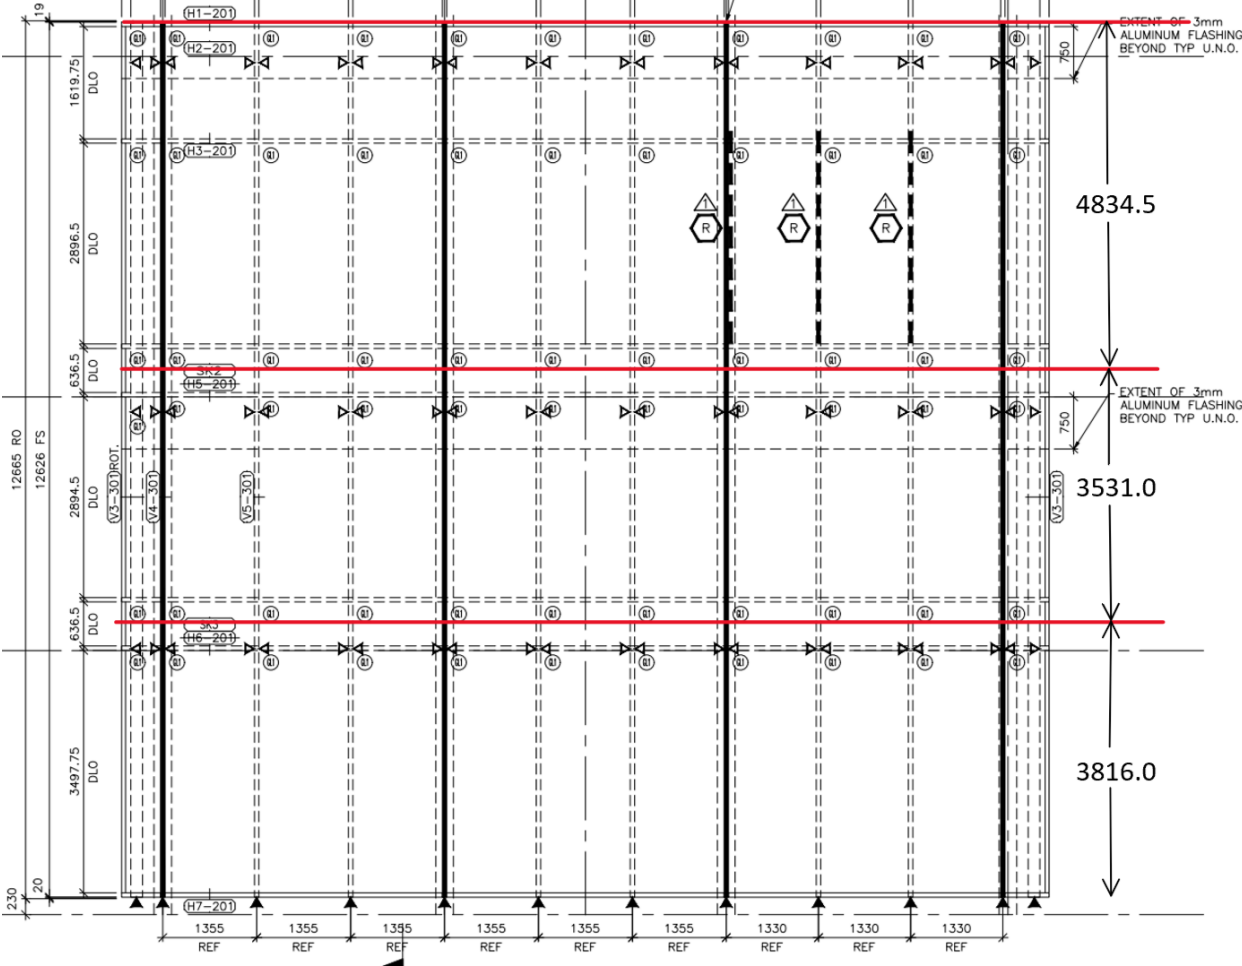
Shop drawing of south facing curtain wall with proposed solar shading location.
